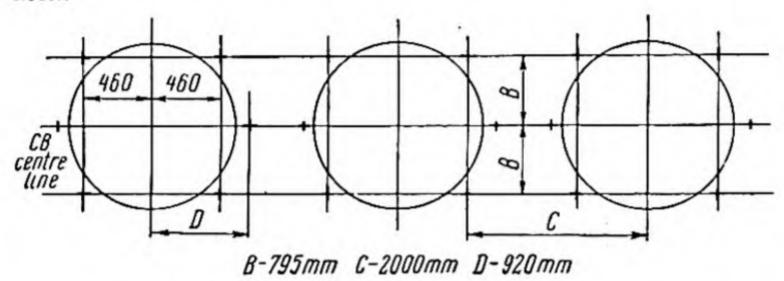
Layout of anchor bolts for MKII-110 oil circuit breaker
